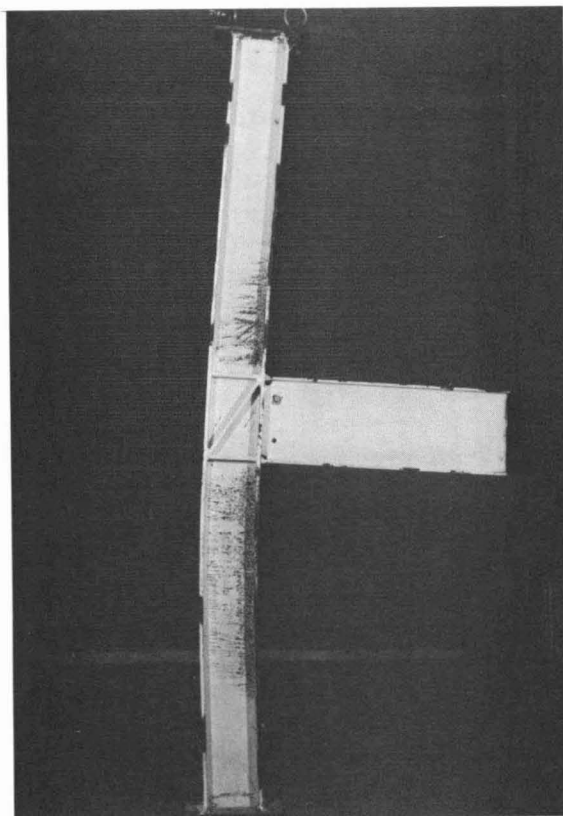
DEFORMED SPECIMEN AFTER TEST RC-3
